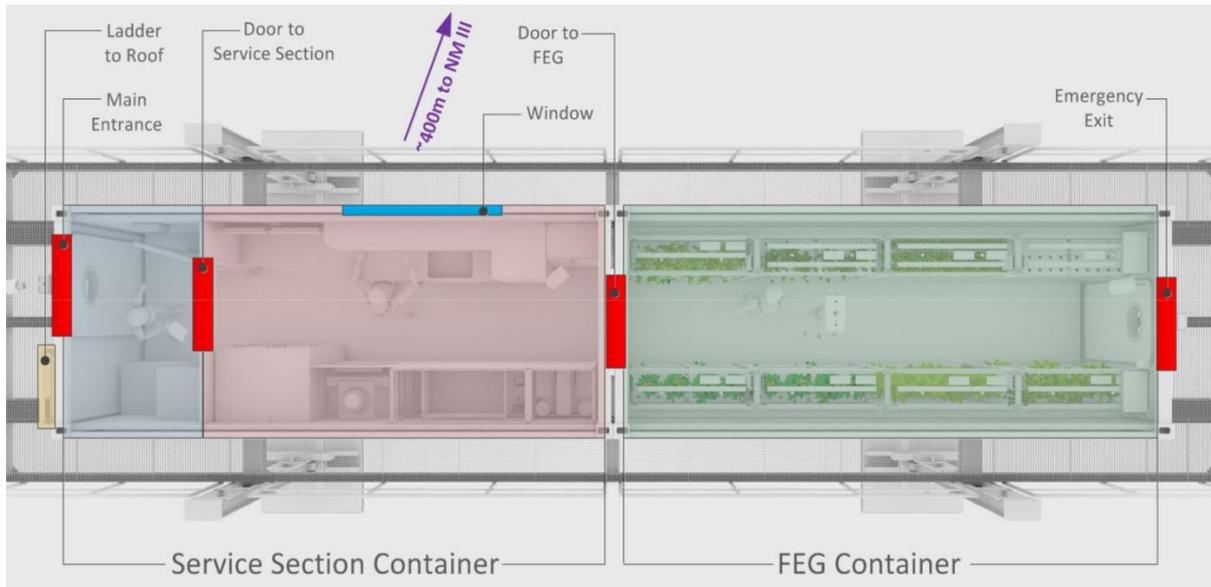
Floor plan of the EDEN ISS Mobile Test Facility (blue: cold porch; red: service section; green: cultivation area (FEG)) [6]
